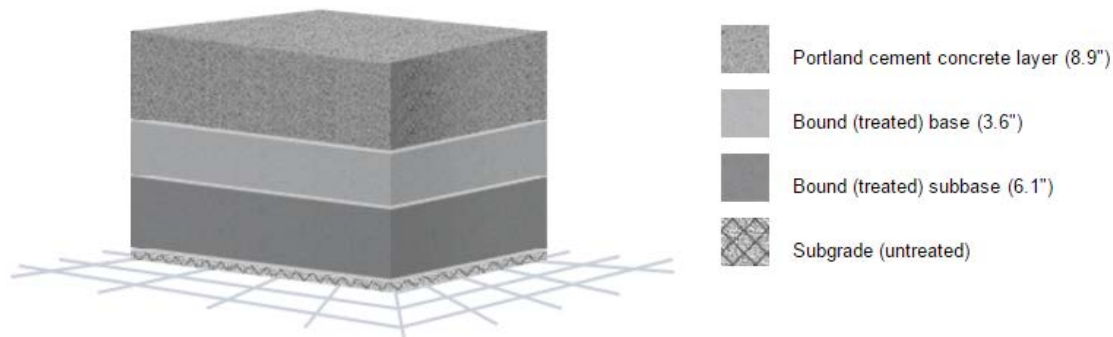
Pavement structure of LTPP Segment 40-3018
